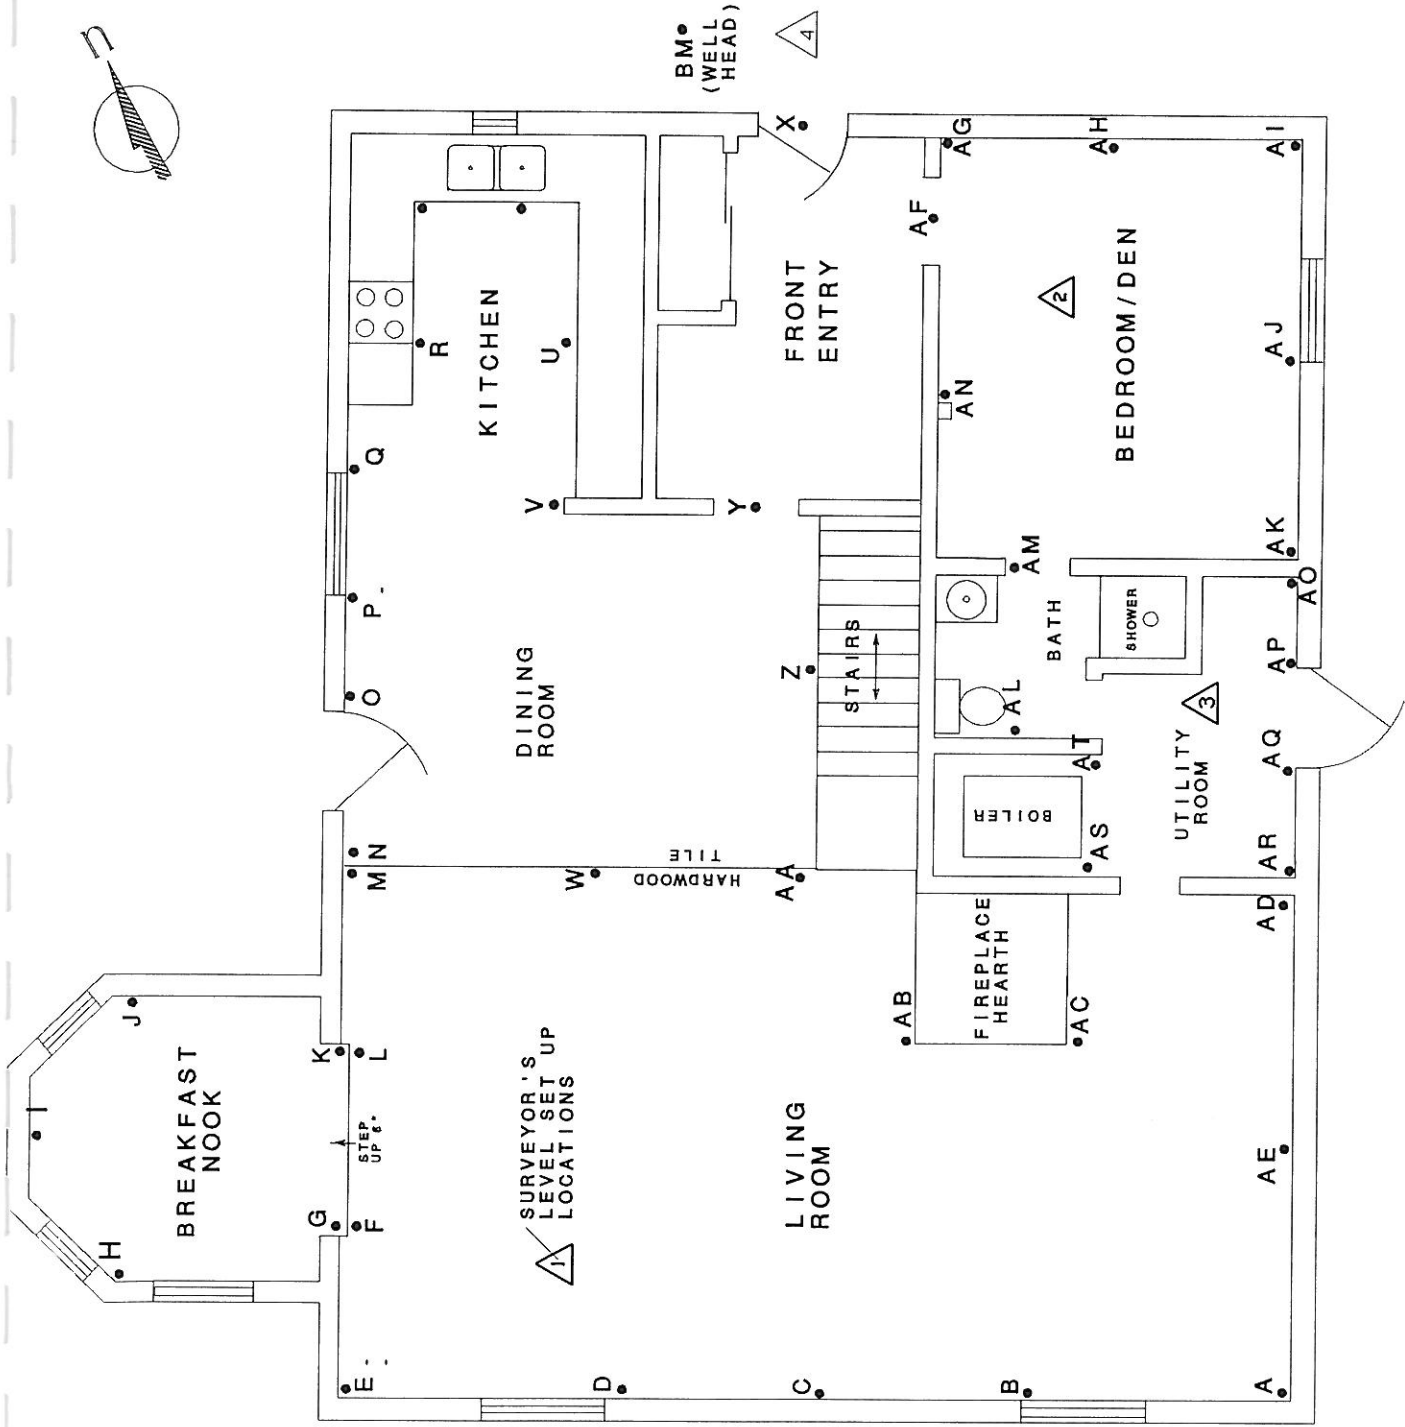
BALLAINE GROUND FLOOR PLAN AND LEVEL LOCATIONS
